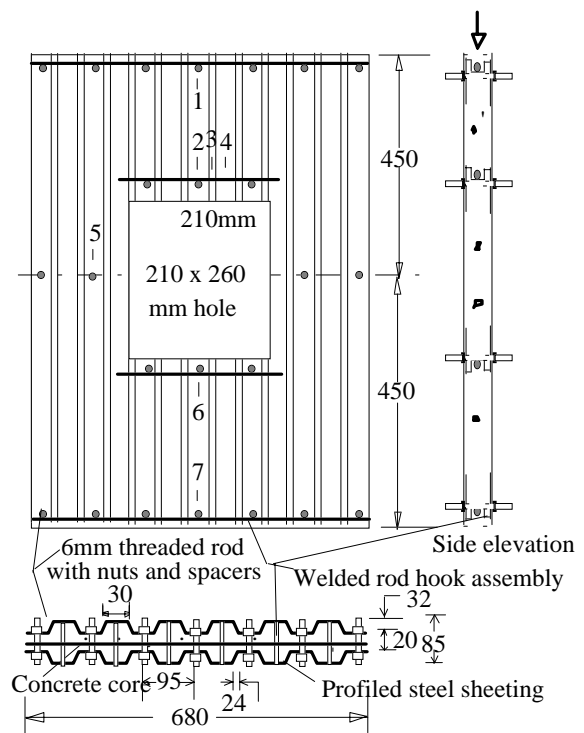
(b): Detailed description and instrumentation of Spandek pilot walls
